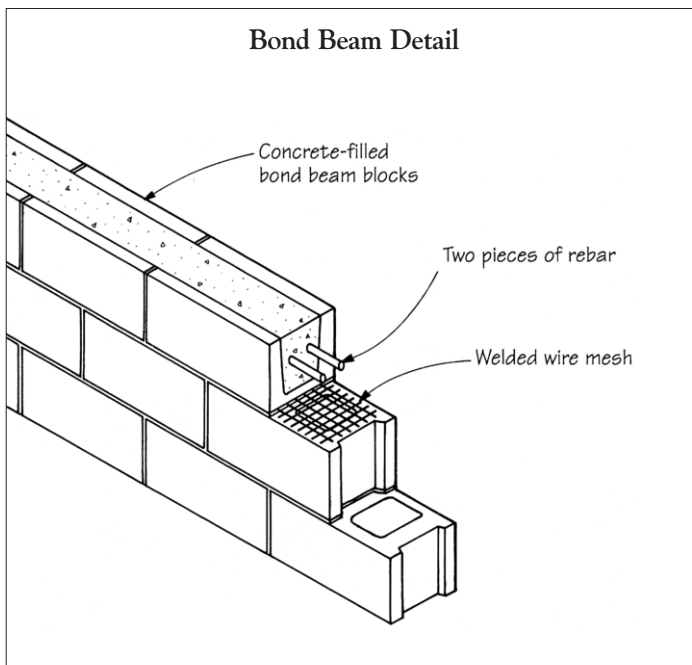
To strengthen a block wall against lateral pressure, the author places a horizontal bond beam halfway up the wall. He also uses horizontal reinforcing mesh in every other course of blocks.
